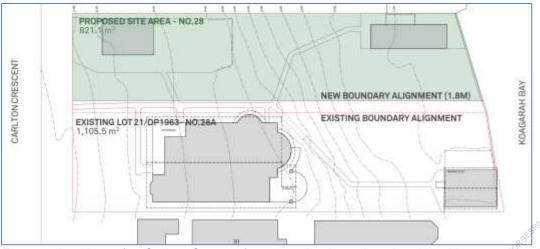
Lot No 22 (28 Carlton Crescent) proposed to be reduced and Lot No 21proposed to be increased by 114.1sqm (Boundary adjustment plan).
